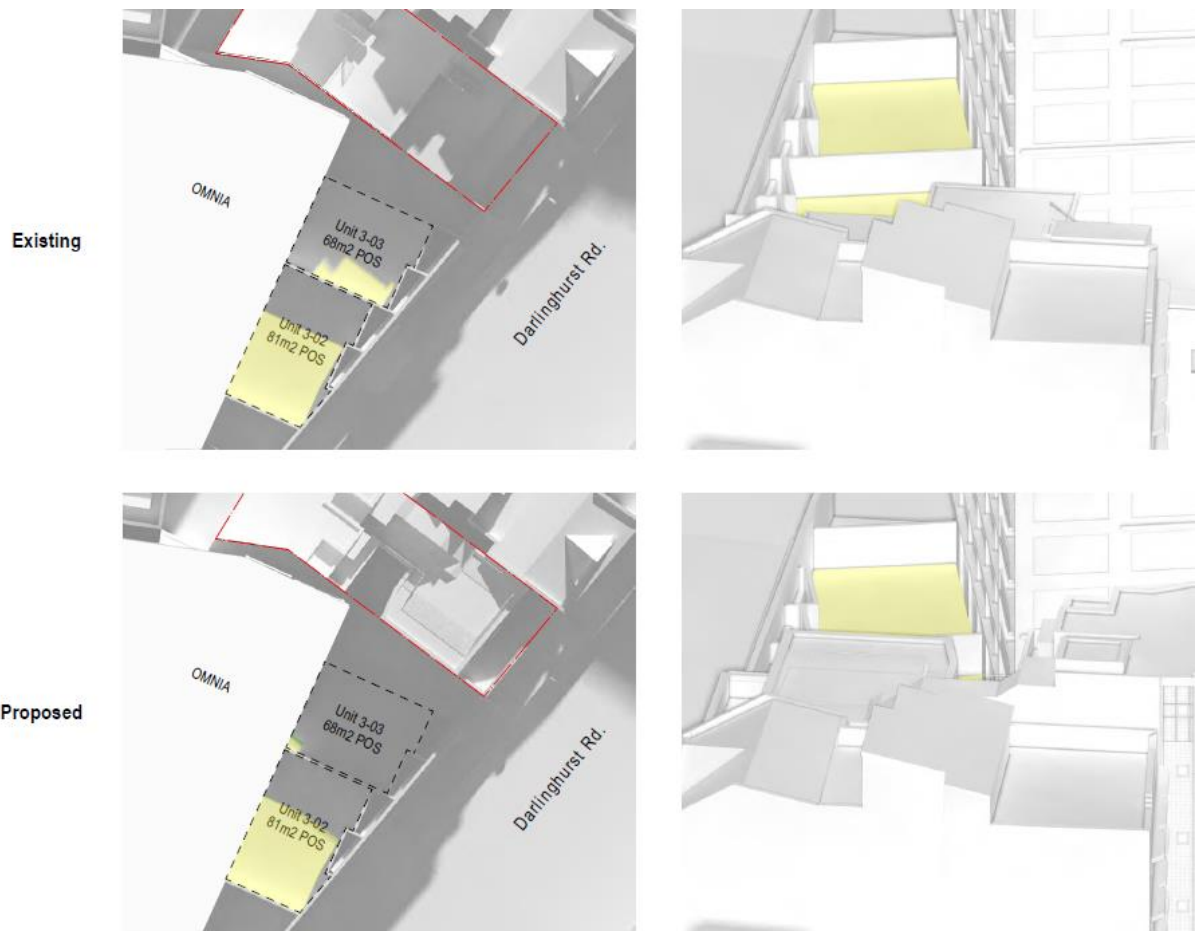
Plan and view from sun diagrams for private open space of Omnia building residential apartments at 10am, 21 June
